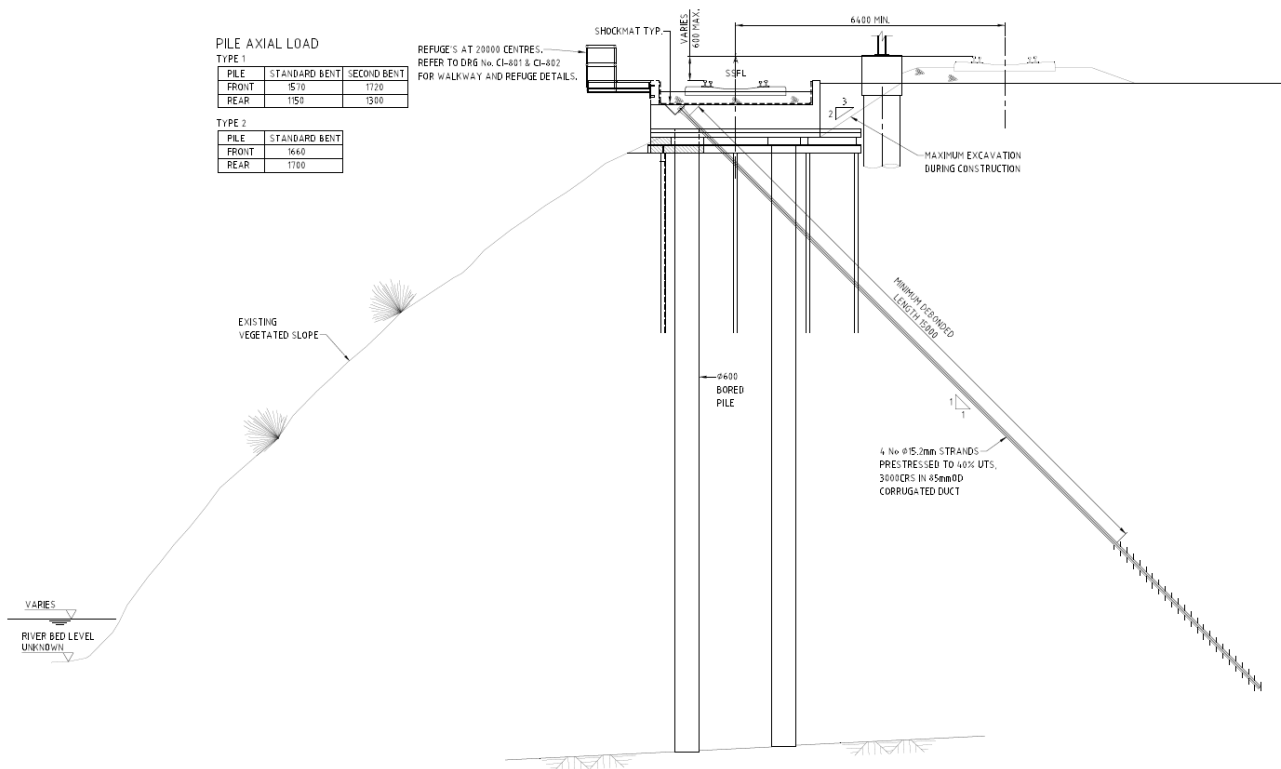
Typical Cross Section through Piled Slab with Incomplete Embankment Support.
